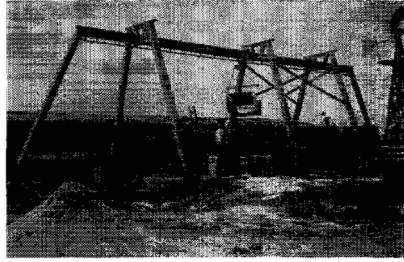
“A pit silo of 48 tons capacity was constructed in 1915. A second pit silo was constructed in 1921 and the first pit silo dug 6 feet deeper, making it 30 feet in depth. The total capacity of the two silos was about 100 tons.”
